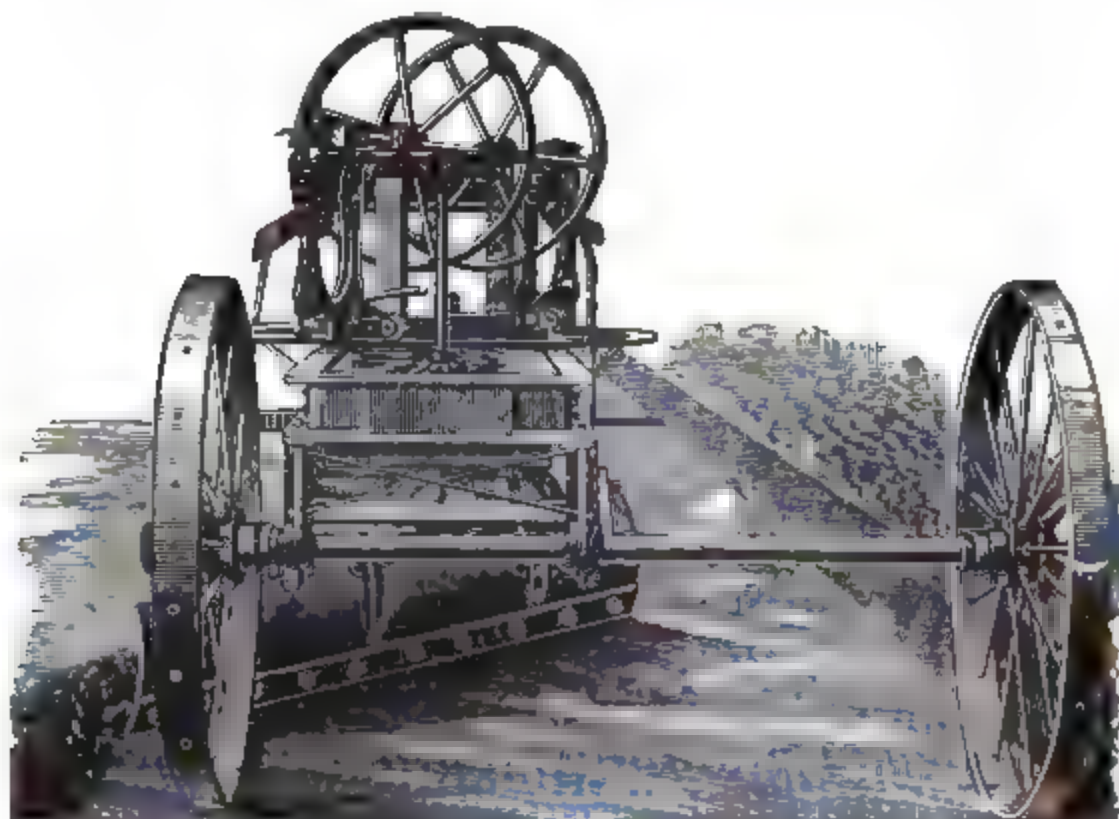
SCRAPING GRADER WITH ADJUSTABLE REAR AXLE.
